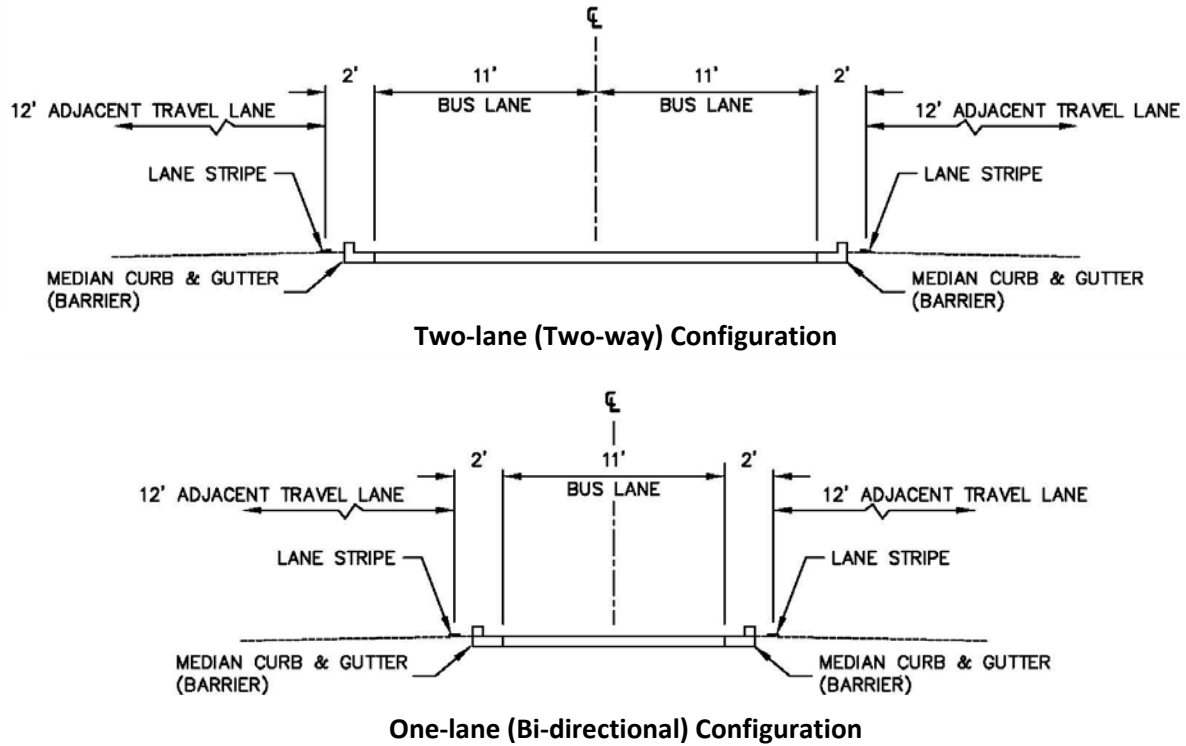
Guided Side-Running (Separate) BRT Busway Typical Sections
